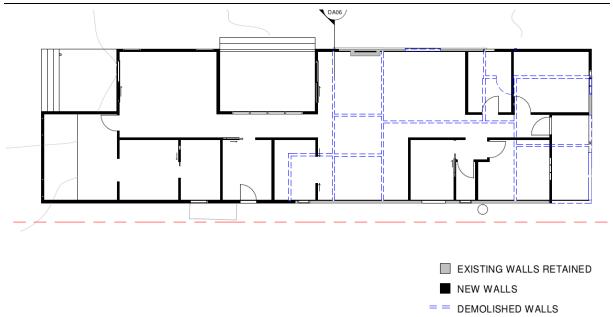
Plan showing demolition work and new work proposed under DA.2020.1648.
